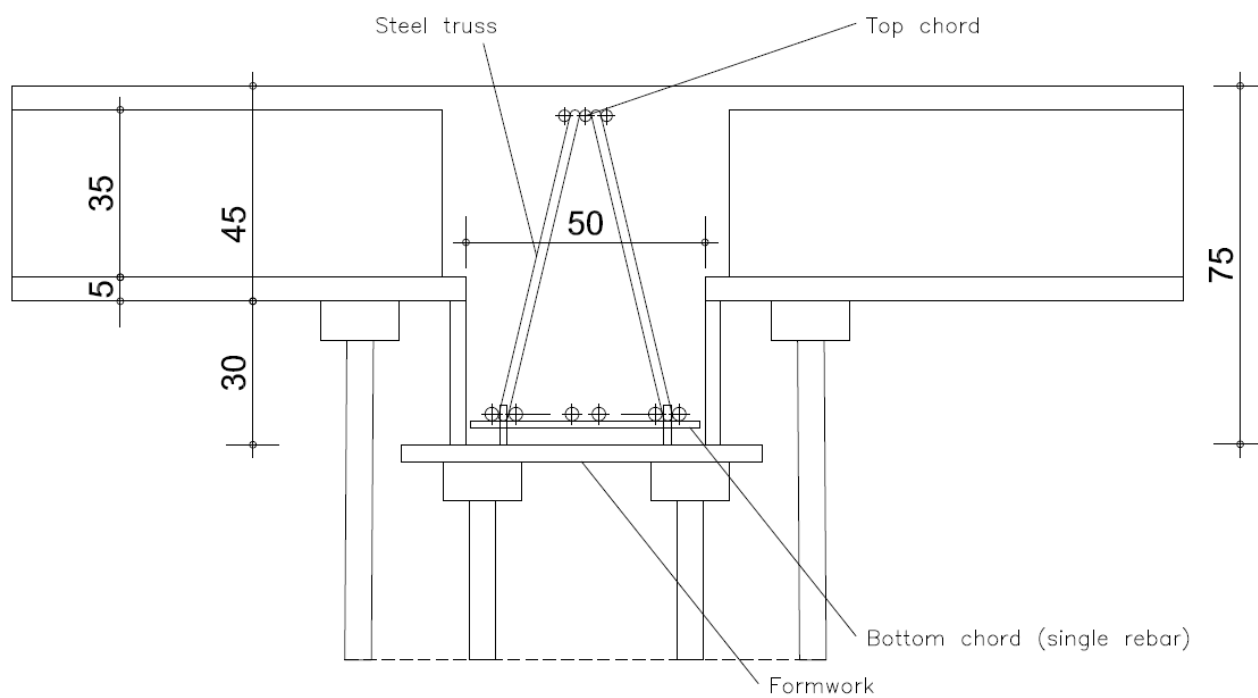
Technical drawing representing the cross section and layout of CSTCBs R101 and R102.
